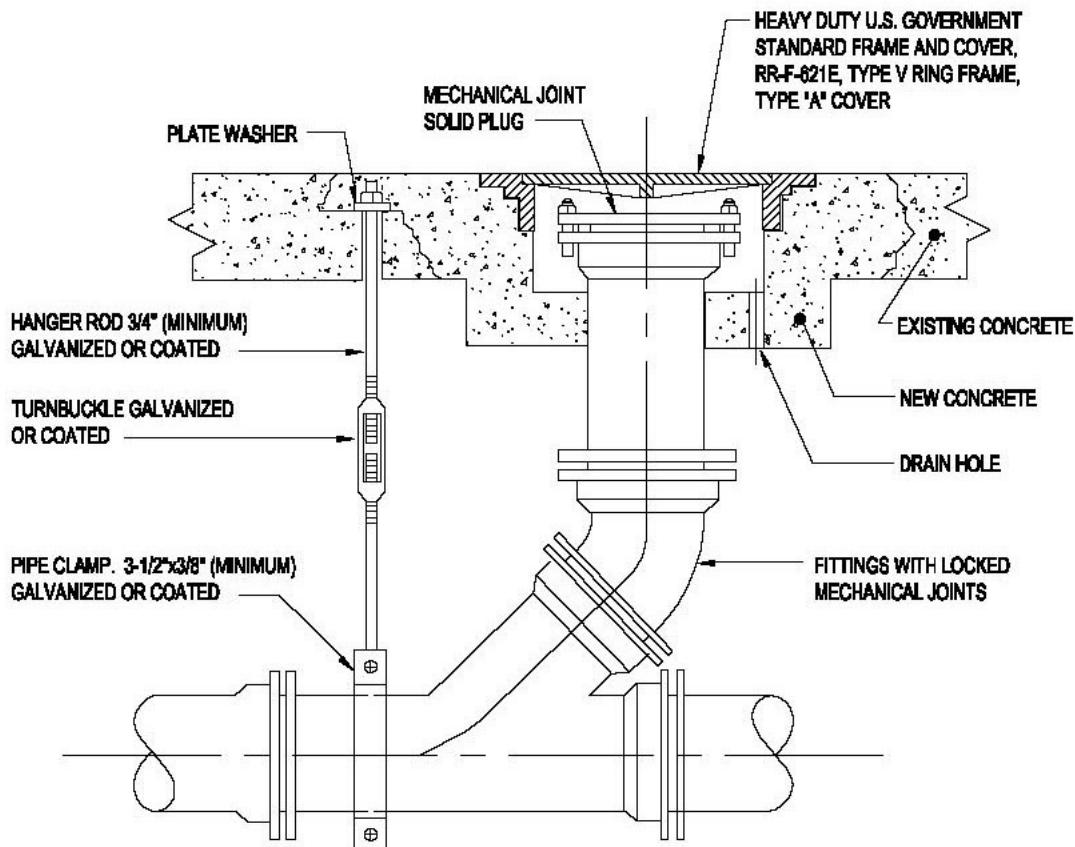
B Details of Sewage Collection Facilities (2 of 2)
